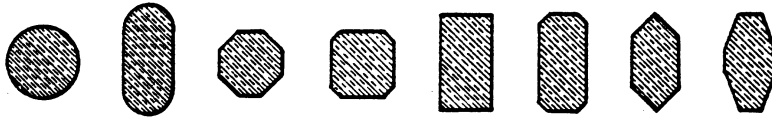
Typical cross-section shapes of piers for overcrossings or viaducts on land.
